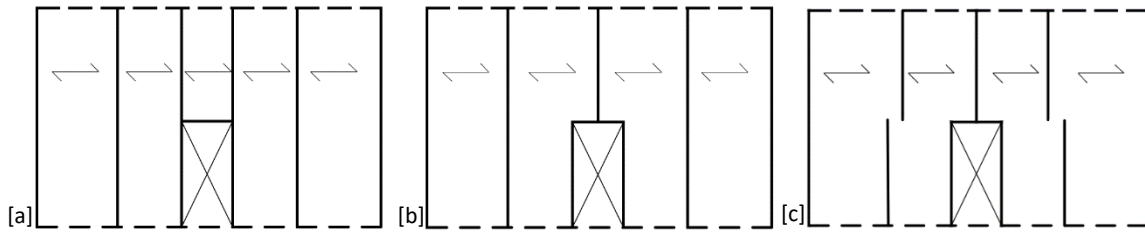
Main structural floor plan divisions. [a] Variant 1; [b] Variant 2; [c] Variant 3 (Self-produced).
